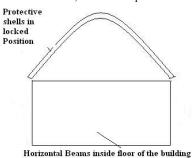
Day time lives saving – shells lying on horizontal beam, embedded into floor, in locked position are shown.
